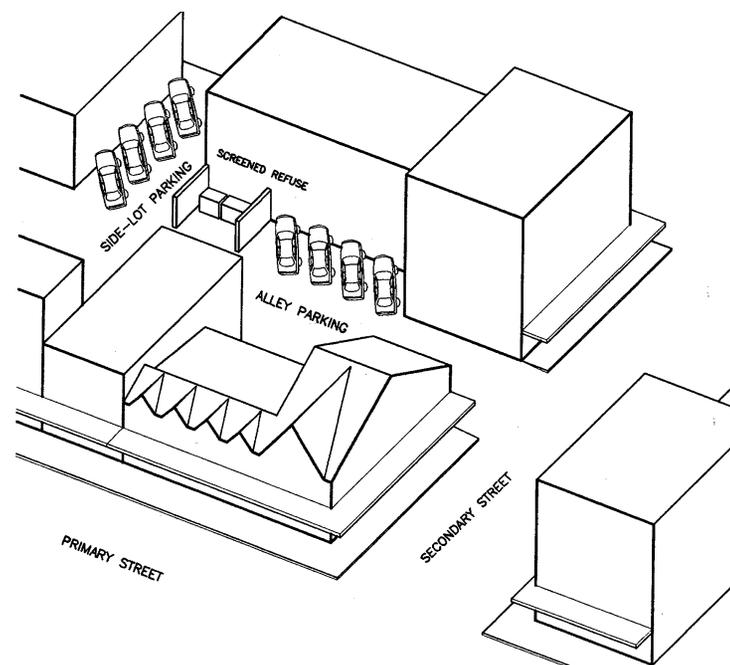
Corner massing, setbacks, building orientation, off-street parking, and screening.
